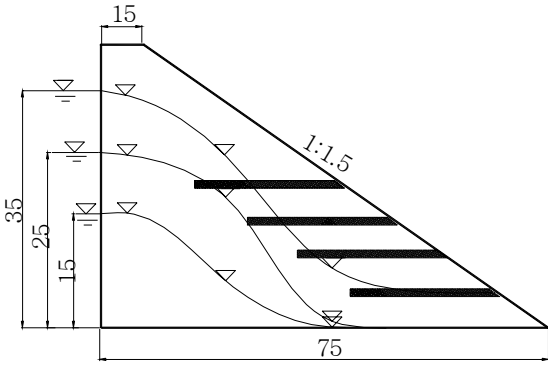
Seepage line of reinforced embankment in sand (Dr=40%, 1:1.5, Fast rising)
